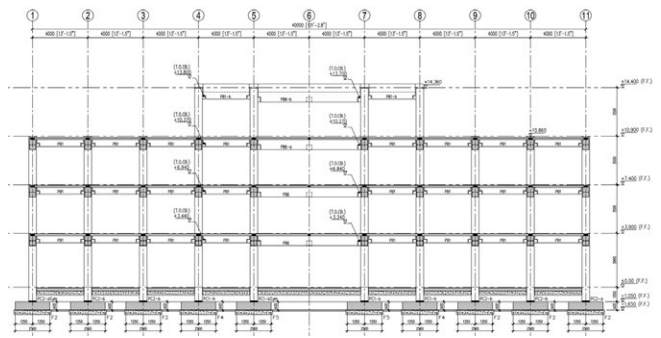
LONGITUDINAL ELEVATION OF STRUCTURAL PRECAST CONCRETE FRAME SYSTEM
